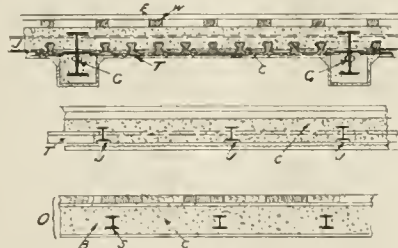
J, steel joists; T, special fire-resisting tiles dovetailed for plaster; F, floor; W, fillet; G, main beams with angles to carry joists; O.—A simpler system; B, main beams; S, subordinate ditto; C, concrete.
